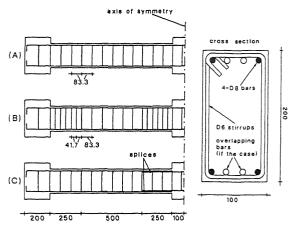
Geometric dimensions and reinforcement distribution of specimens.
